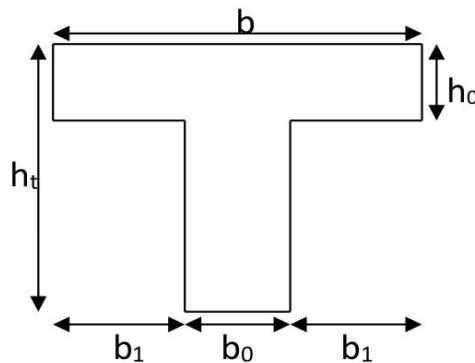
THE T-SECTION DIMENSIONS
